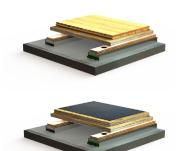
Remove wood and add sprung floor \$2.50-3/SF
